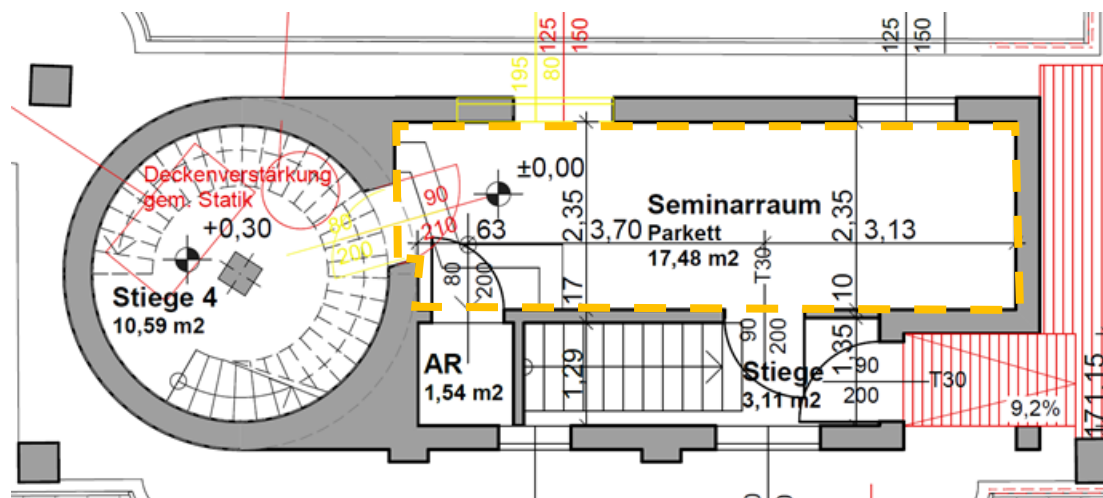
Schematic plan of the test room (source: Department of Building Physics and Building Ecology, TU Wien)
